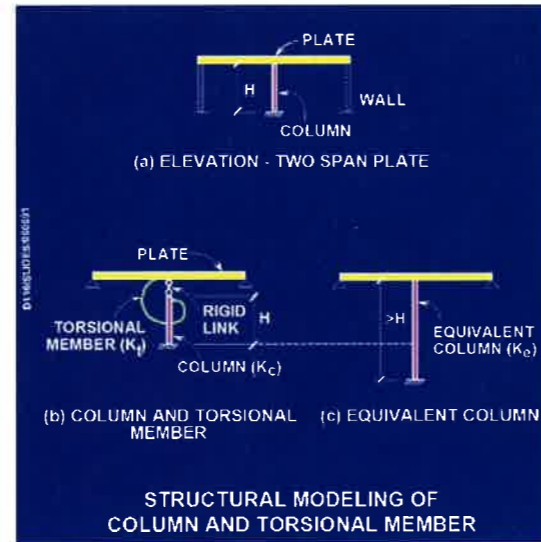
Column Modeling in EFM (P555)
